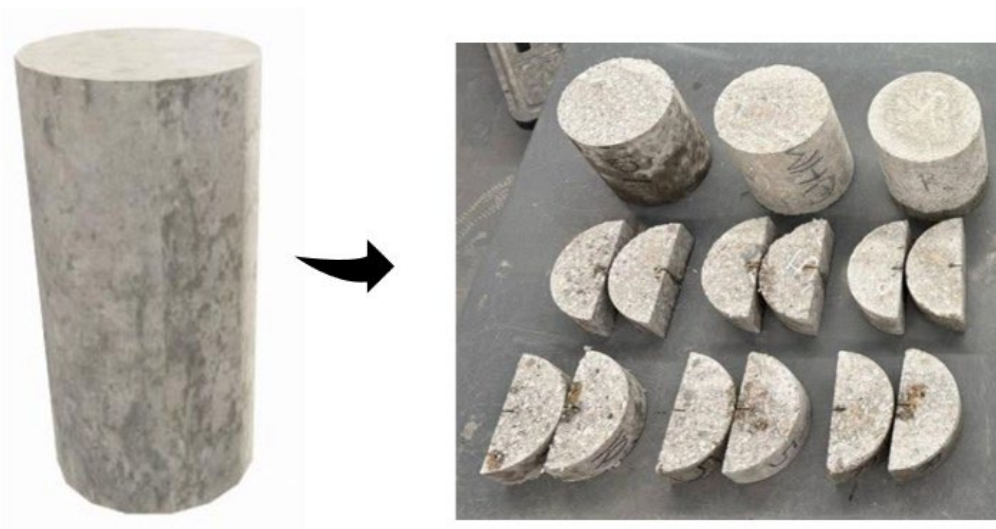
a) Cutting a cylindrical sample, b) Preparing samples for the SCB test.
